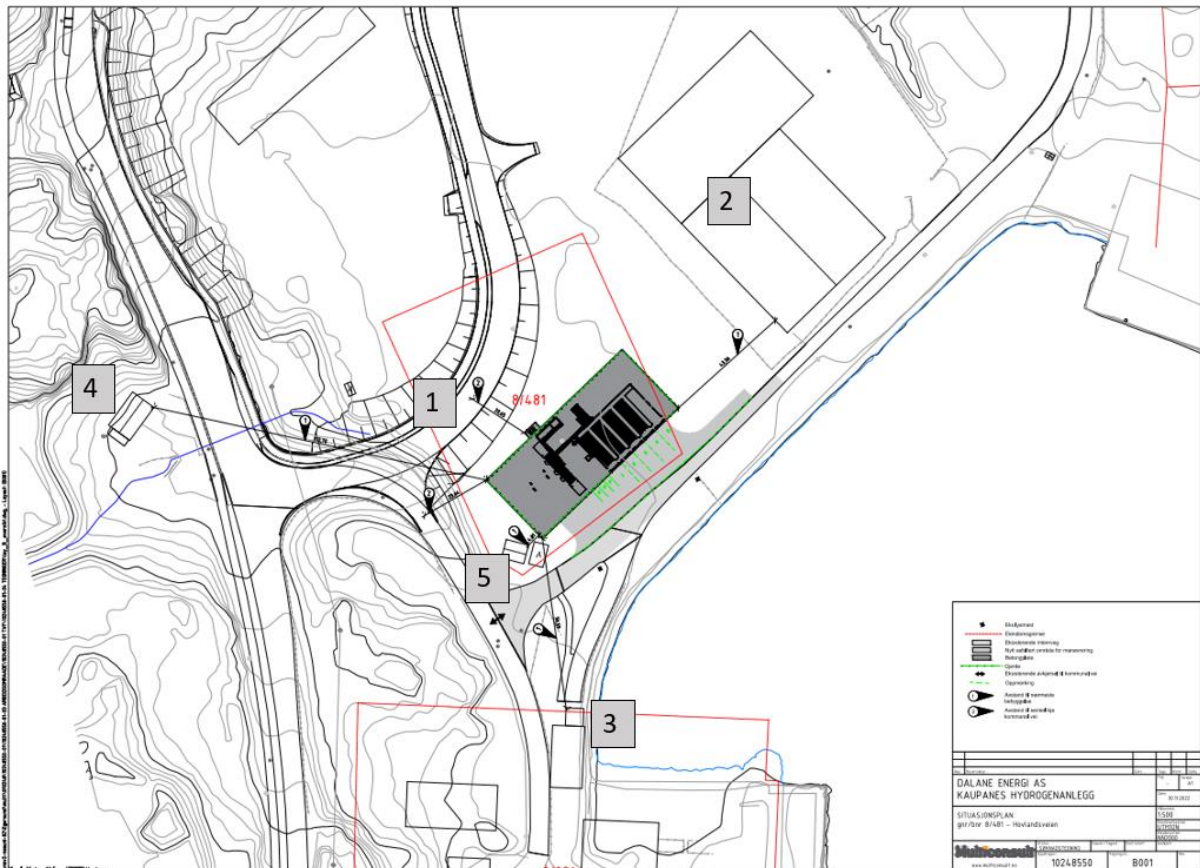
Layout of hydrogen facility and nearby objects according to situation plan. Source: Multiconsult
